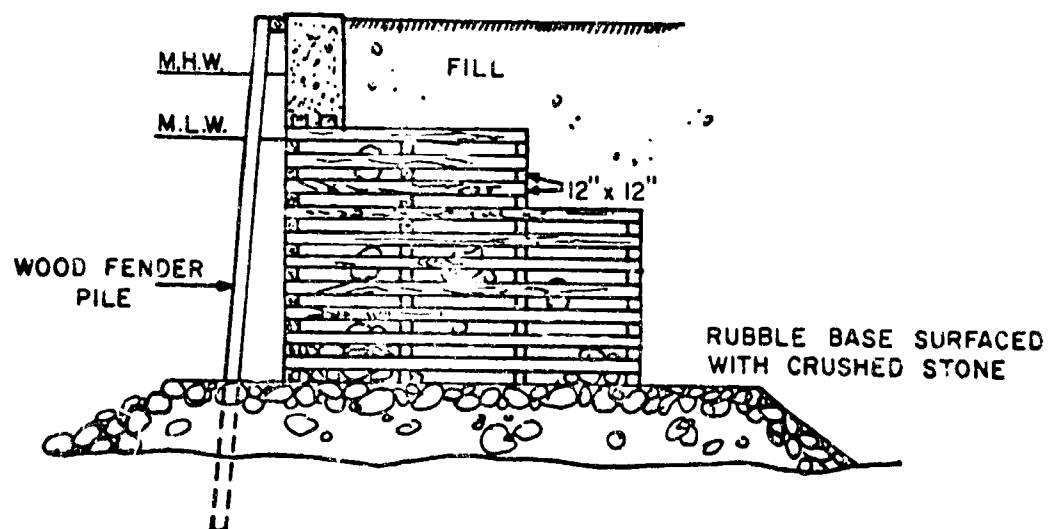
TYPICAL TIMBER CRIB WALL
